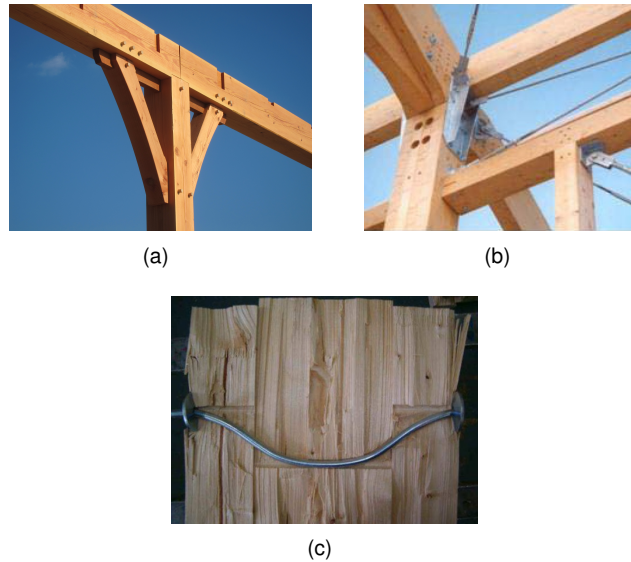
(a) *Traditional carpentry joint* - (b) *Column- beam connection* - (c) *Test on timber to timber connection* (M. Piazza UniTn).
